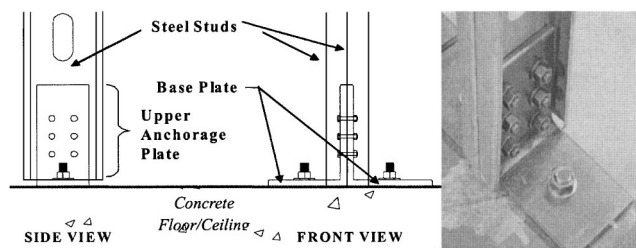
Typical stud-to-floor/ceiling anchorage using a 12.7 mm thick steel angle
